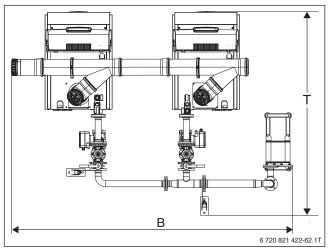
2-boiler cascade, lane installation (dimensions → Table 30, page 79)
